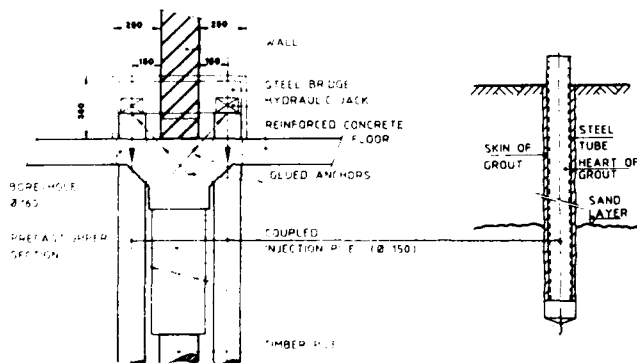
Design of the foundation improvement and principle of the injection pile (dimensions in mm)
